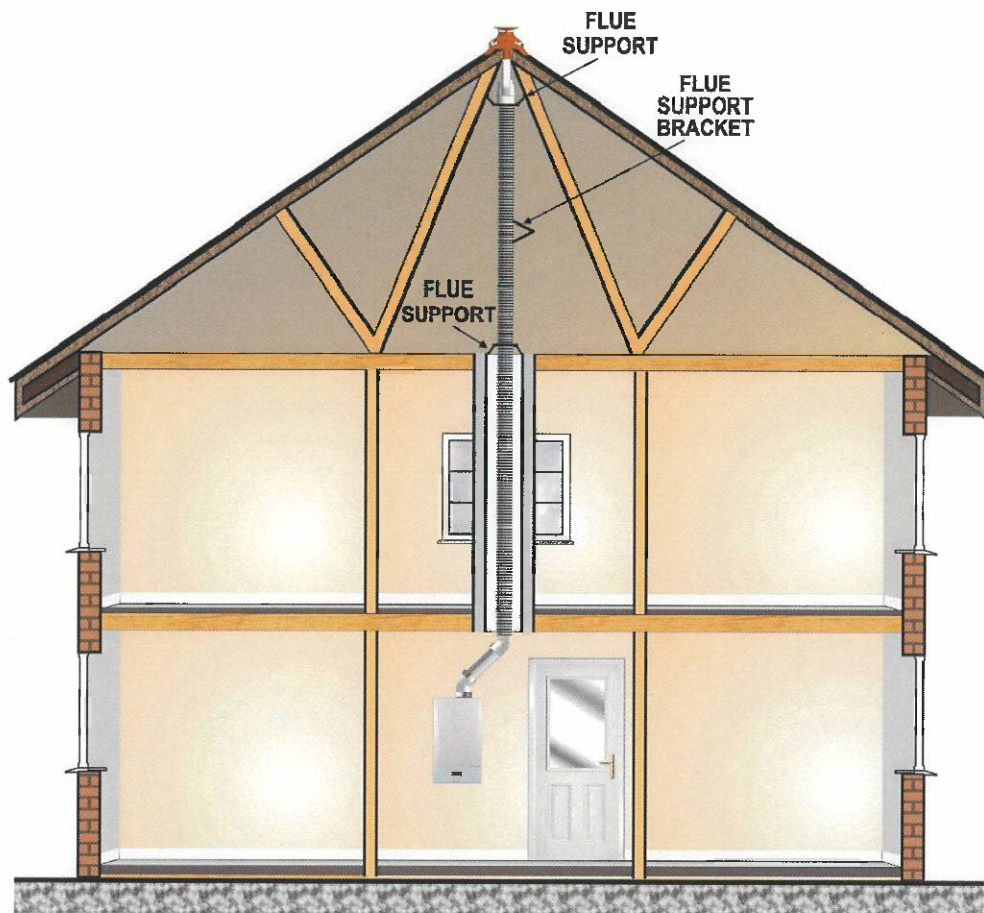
Traditional chimney system from boiler to flexible chimney system in a void and roof space. Check manufacturer's literature to see if this installation arrangement is approved.
